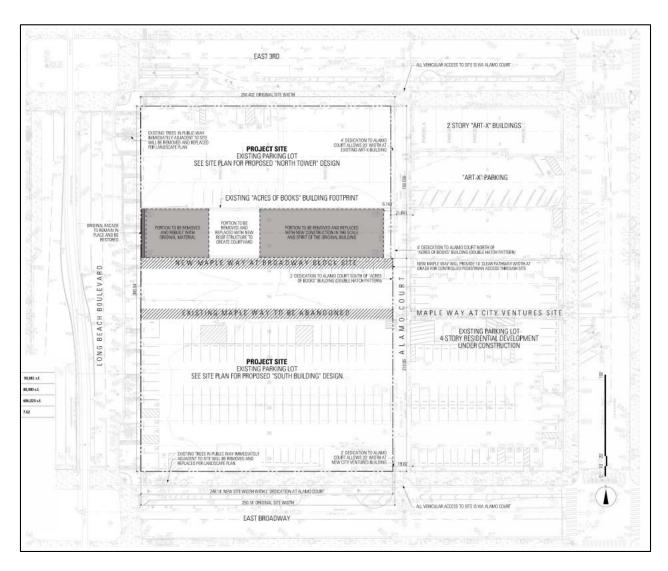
Broadway Block site plan prior to construction (construction is currently underway).
